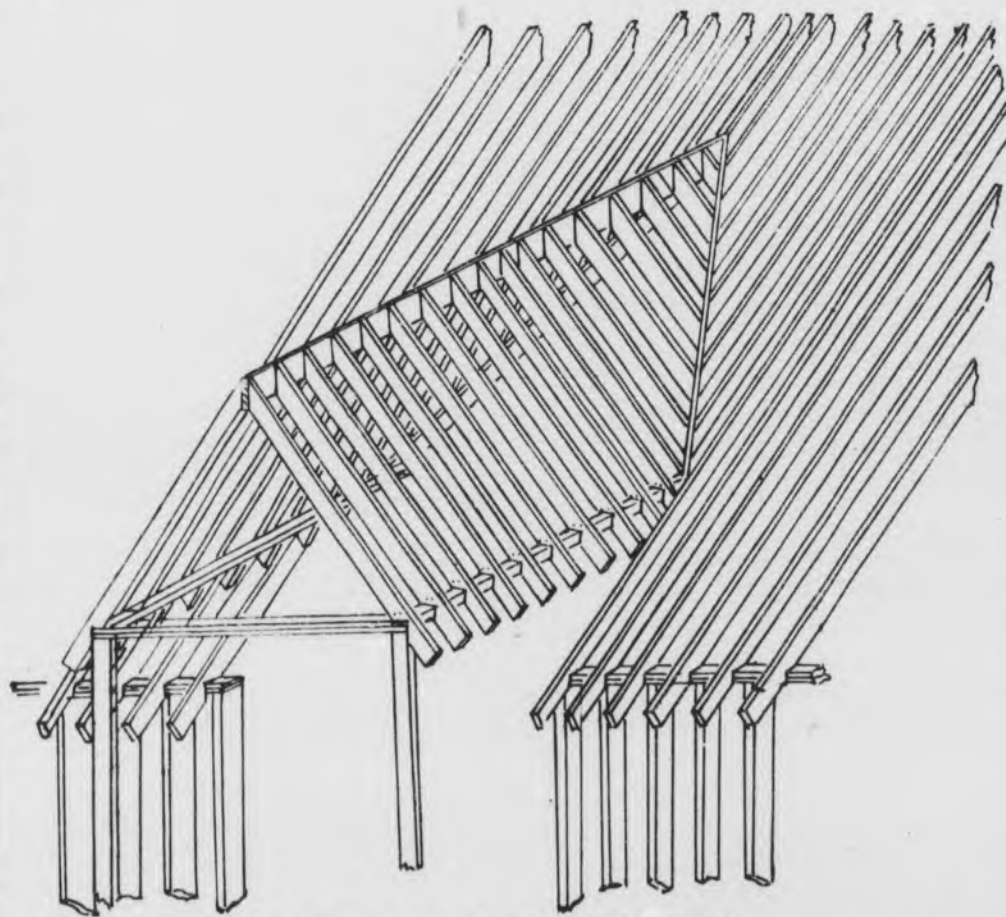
ROOF TIMBERS WHEN RAISED.
